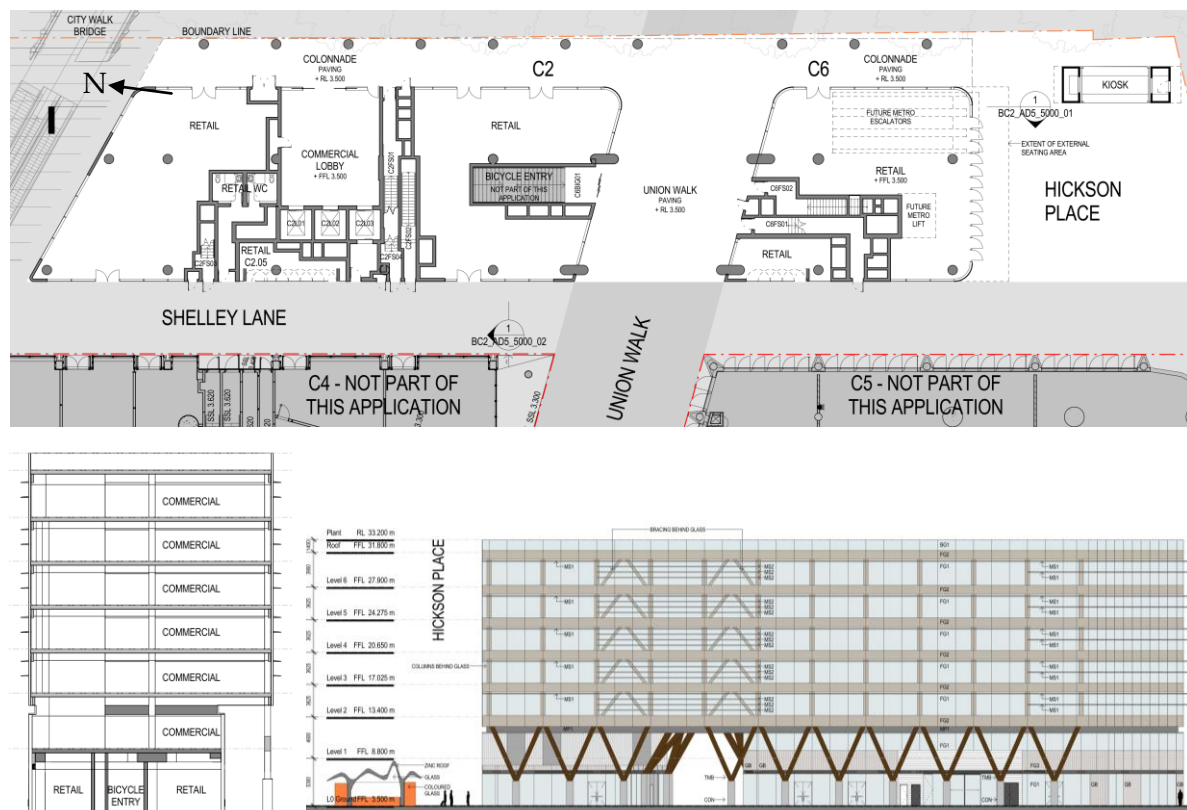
Typical floor plan (T), section looking north (BL), east elevation (BR) of the proposed Barangaroo South C2 development
